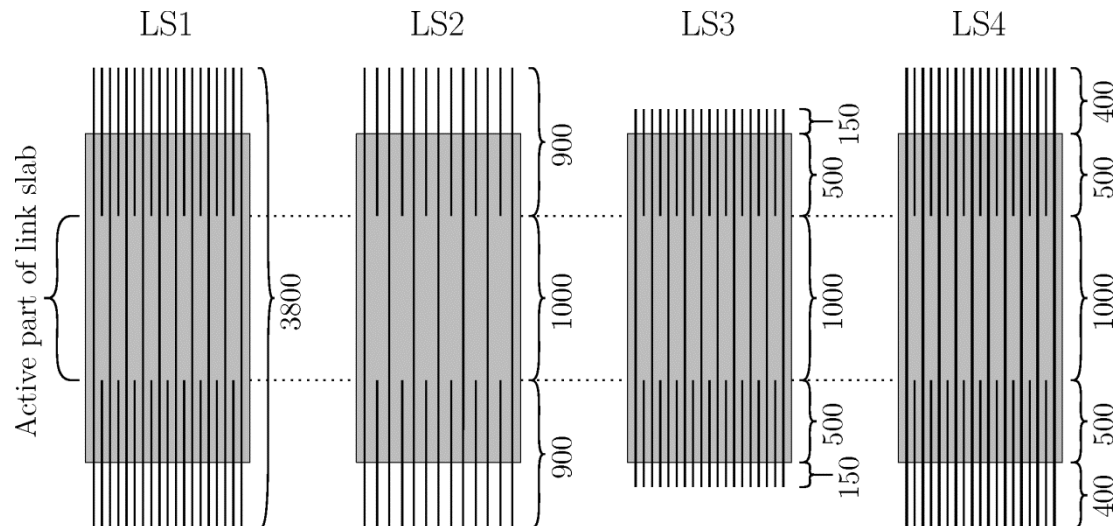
Plane view of rebar layout in all link slabs. Dimensions are given in mm.
